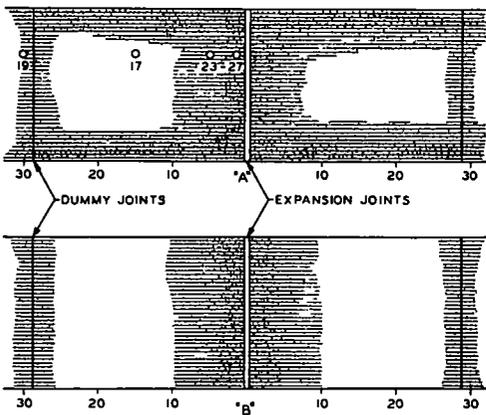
"A"—Plan of Pavement Showing Moisture Distribution under Standard Section with No Lip Curb. "B"—Plan of Pavement Showing Moisture Distribution under Standard Section with Lip Curb.
